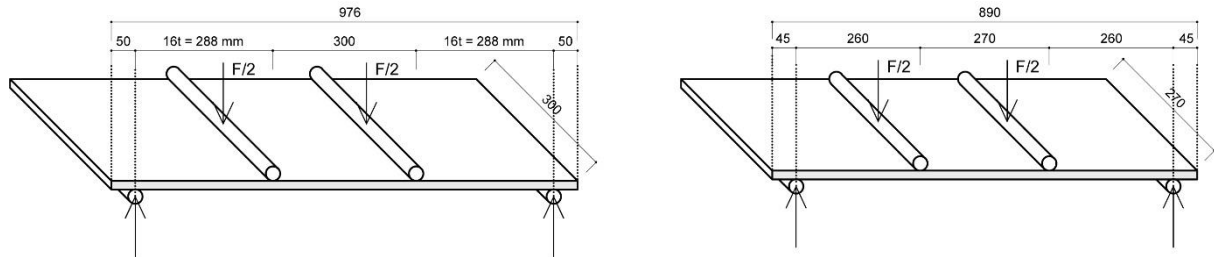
(Left): Test piece dimensions and arrangement according to UNI EN 789. (Right): Reduced test piece dimensions used in Lab test.
